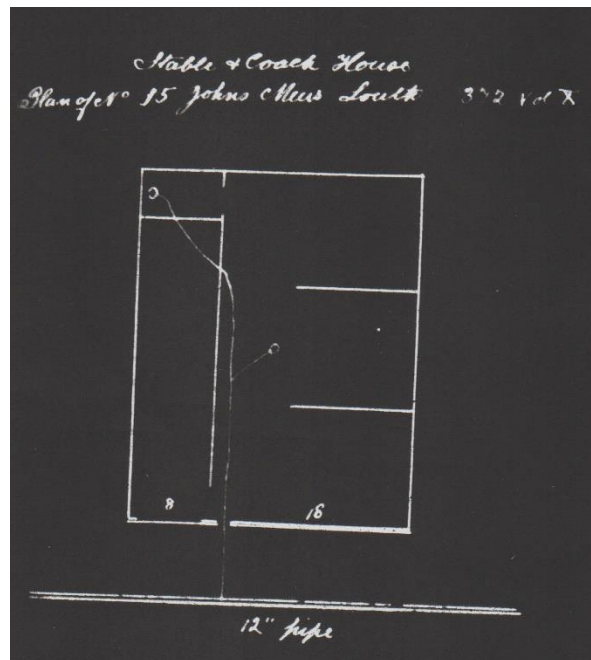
The ground plan of 15 Johns Mews in 1854 (Camden drainage plans)
